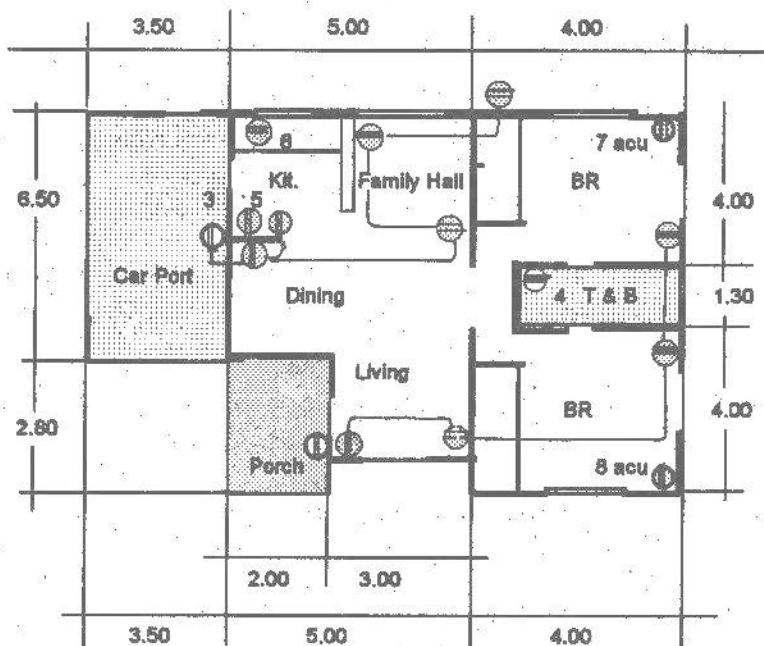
16 CONVENIENCE OUTLET LAYOUT
